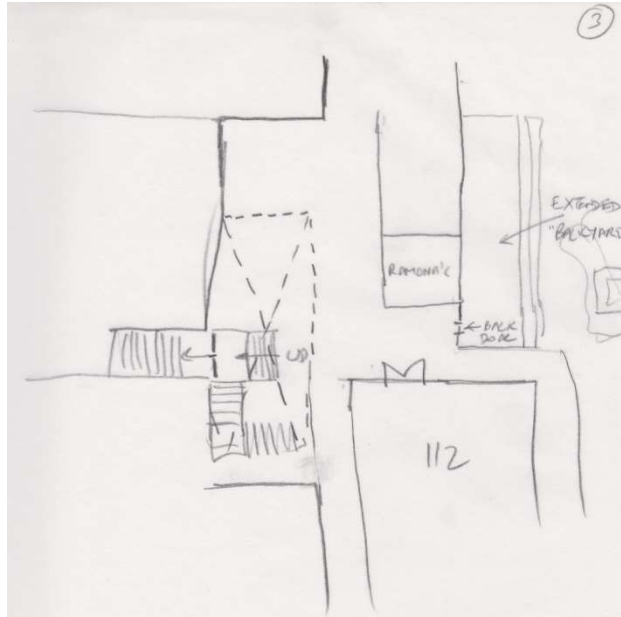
S's final sketch showing a proposed plan of the 1st floor, with the extended "backyard"
